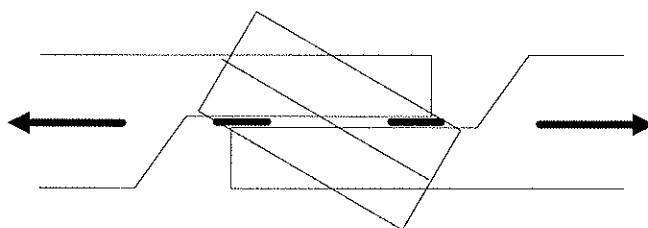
Weakening of the nail plate to avoid anchorage failure.
